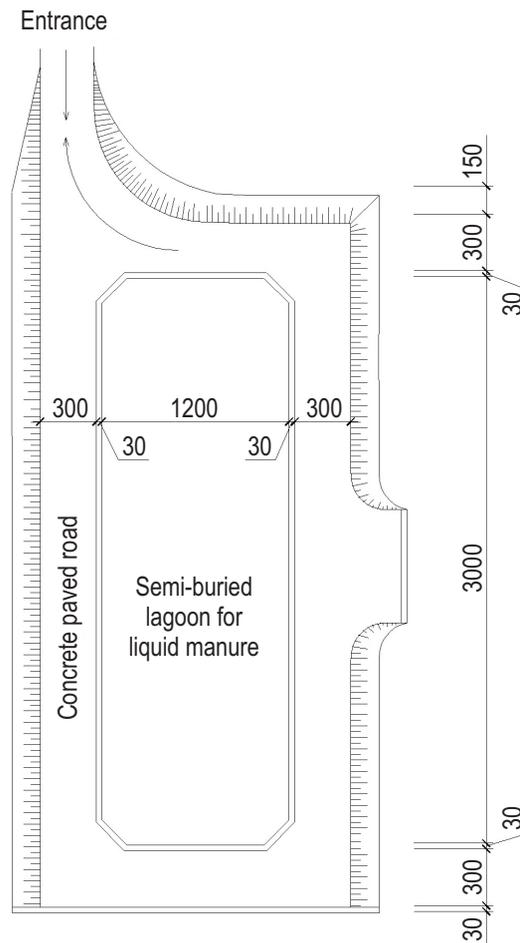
Variant A - semi-buried lagoon with hydro insulated concrete walls and bottom
